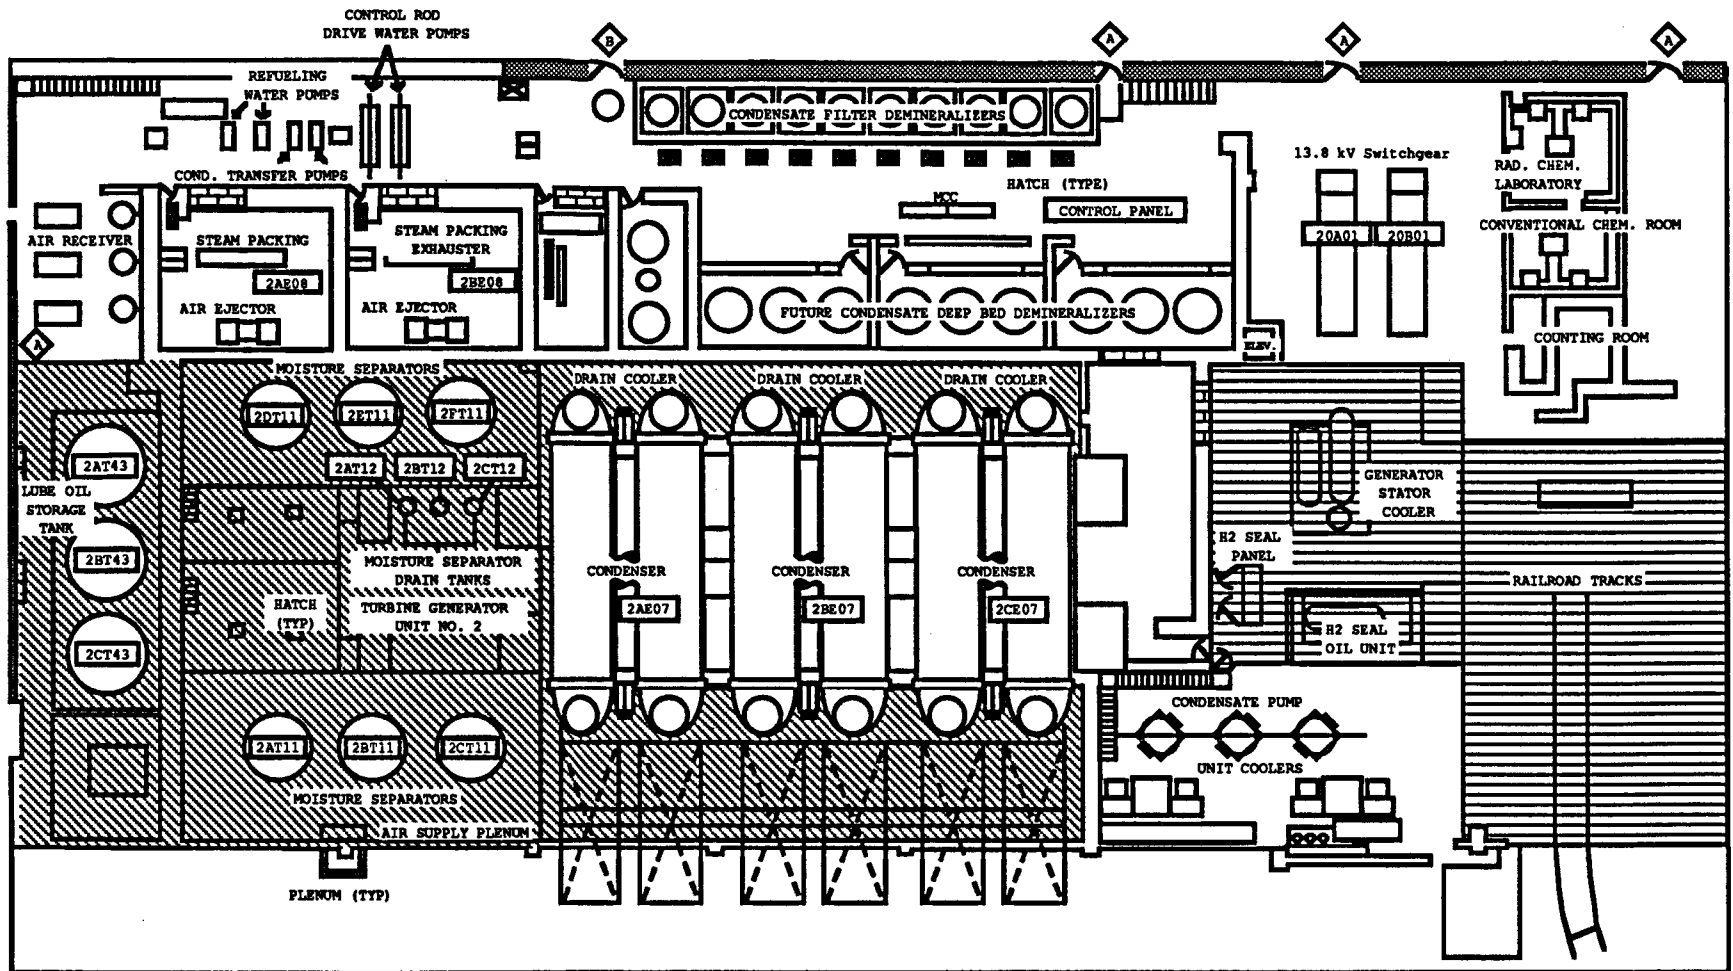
Turbine Building 116' Elevation (Fire Zone 50)
